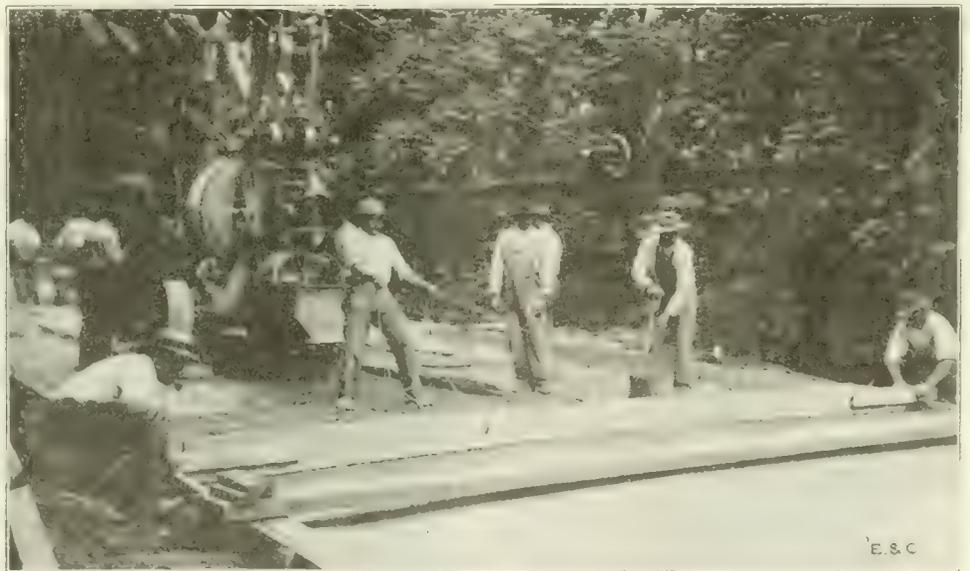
Construction in Progress Showing Method of Handling Striking Board and Mixing Plant.
